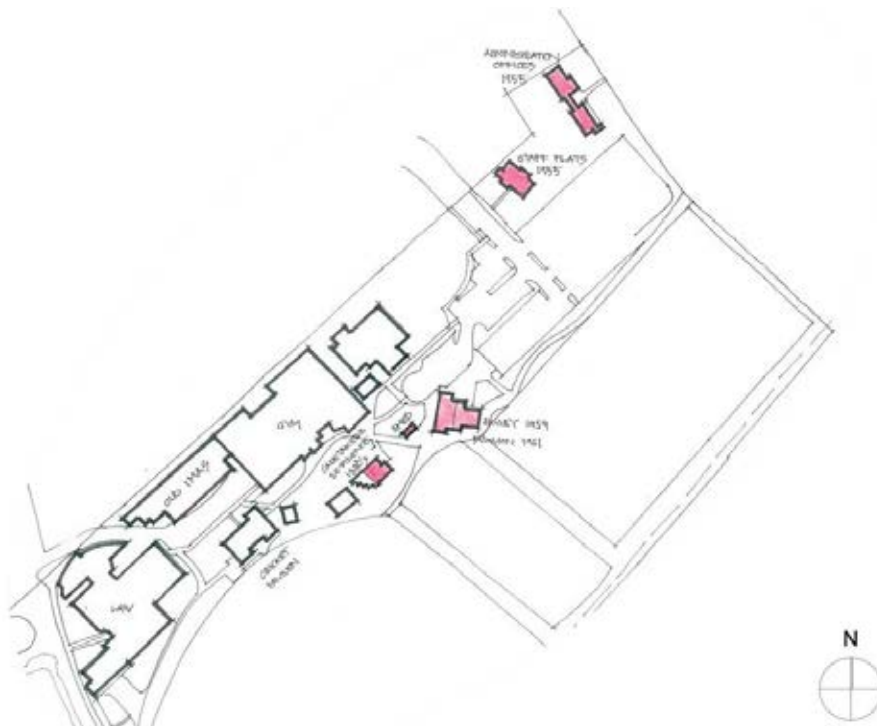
Lower Site plan showing buildings built up to 1969 overlaid on current campus layout. Source: Paul Davies Pty Ltd
